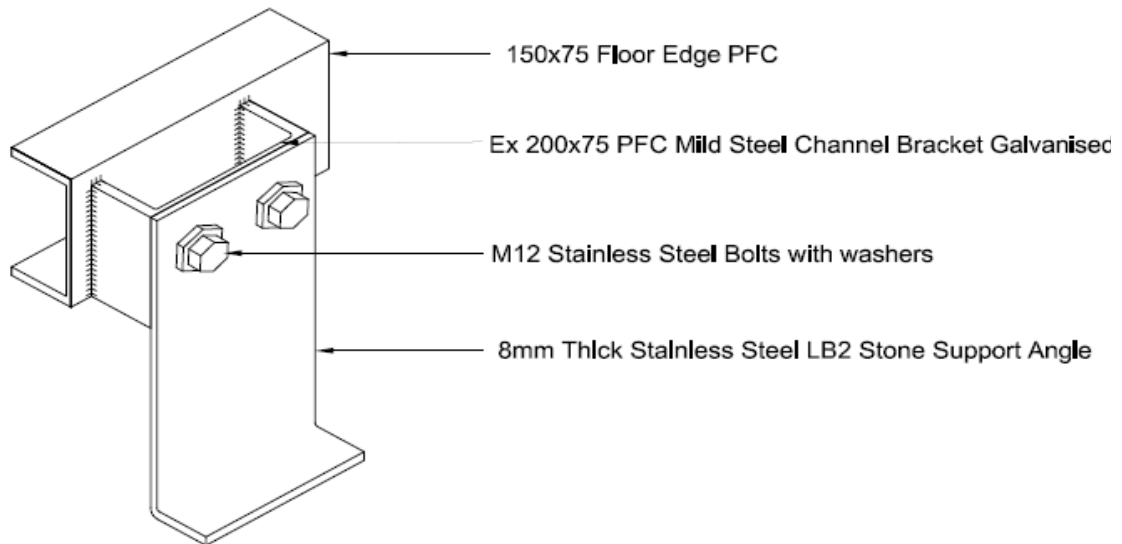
Isometric Of Load-bearing Cladding Support Bracket Connection Detail To Module
